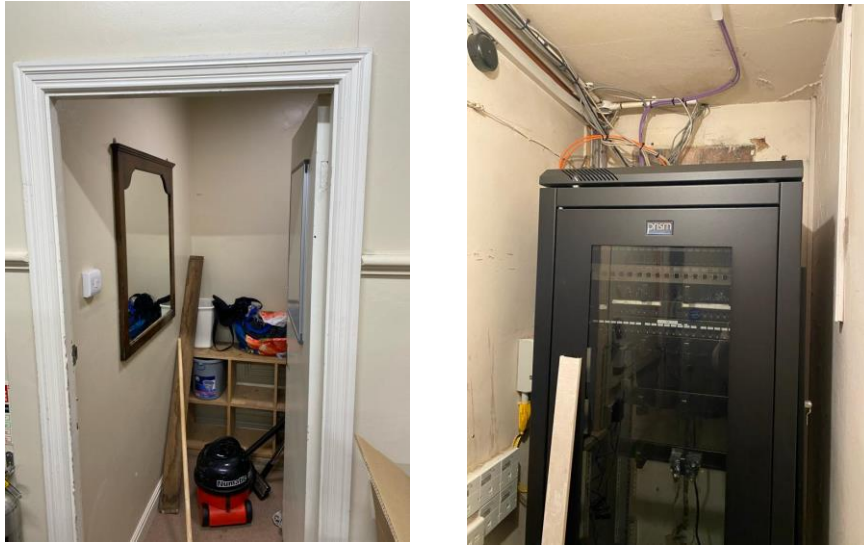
Ground floor store cupboard and landing IT room used for beer pythons
